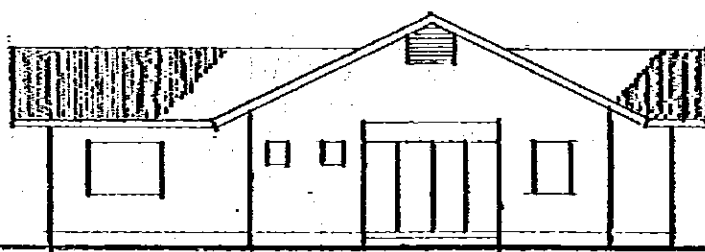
Floor Plan and General Drawings of Pest Observatory Unit
